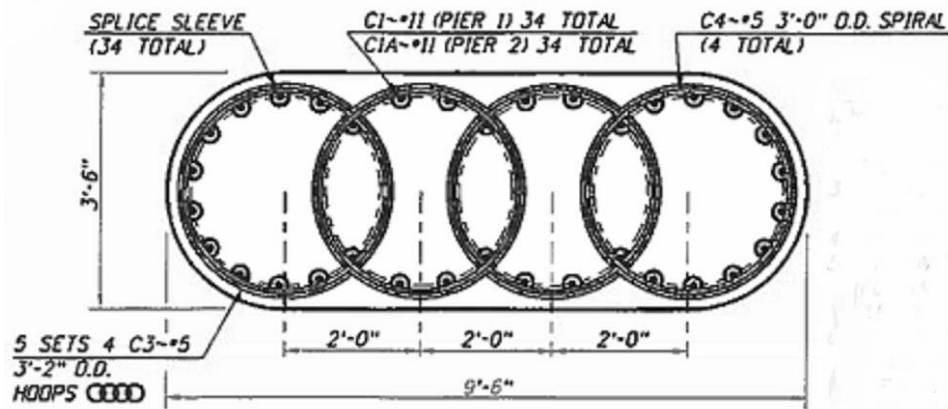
Column Section with Steel and Grouted Coupler Locations
